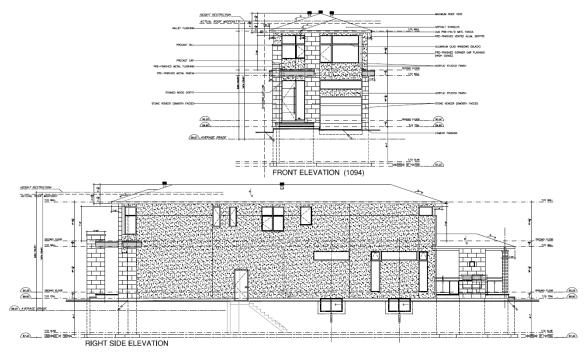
Front and Right-Side Elevations of 1094 Normandy Crescent (Building 1)
